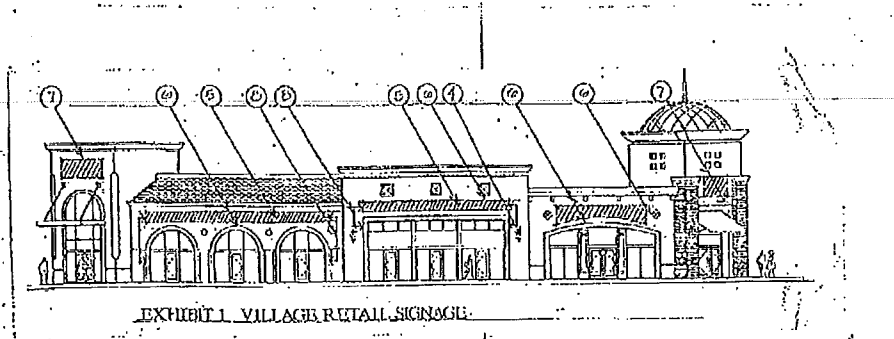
VILLAGE RETAIL SIGNAGE
